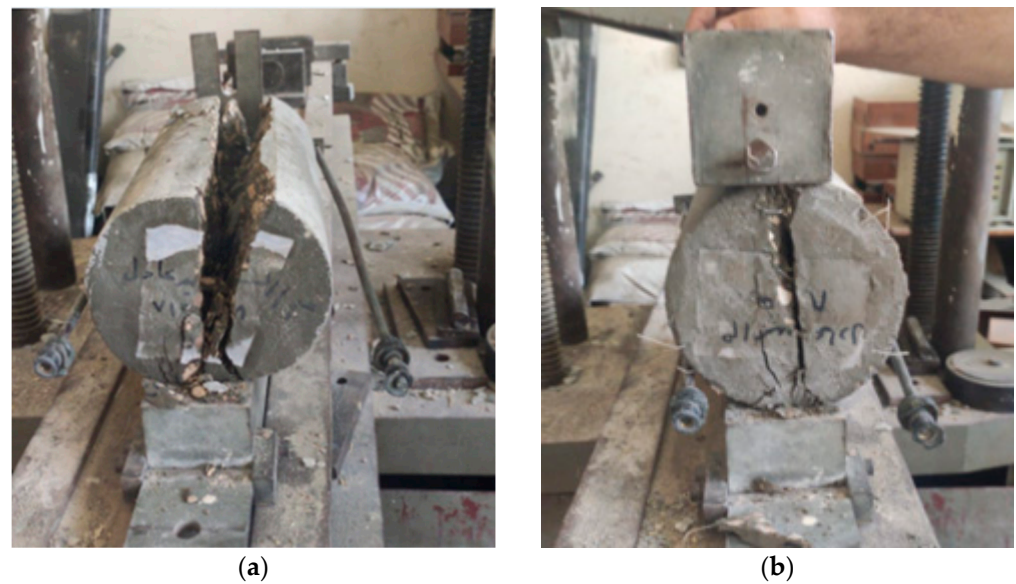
The fracture sample morphology: (a) failed PCC specimen; (b) failed MSFRC specimen.
